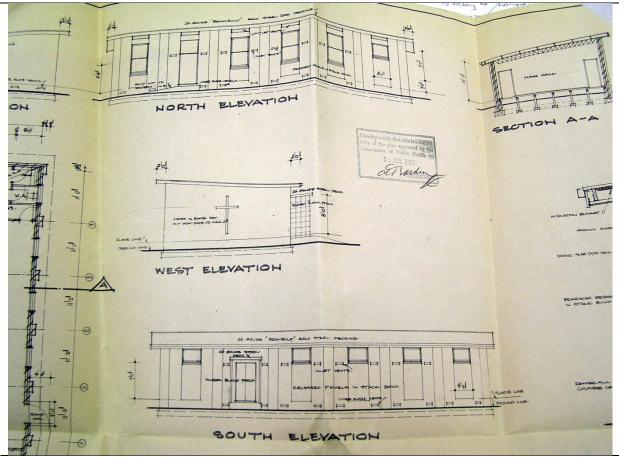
R.L. Strickland & Associates, Elevation & Section Drawings of proposed Sunday School at Ballan, 13 May 1966. Source: Public Building file, VPRS 7882 Unit 4161 PROV.
